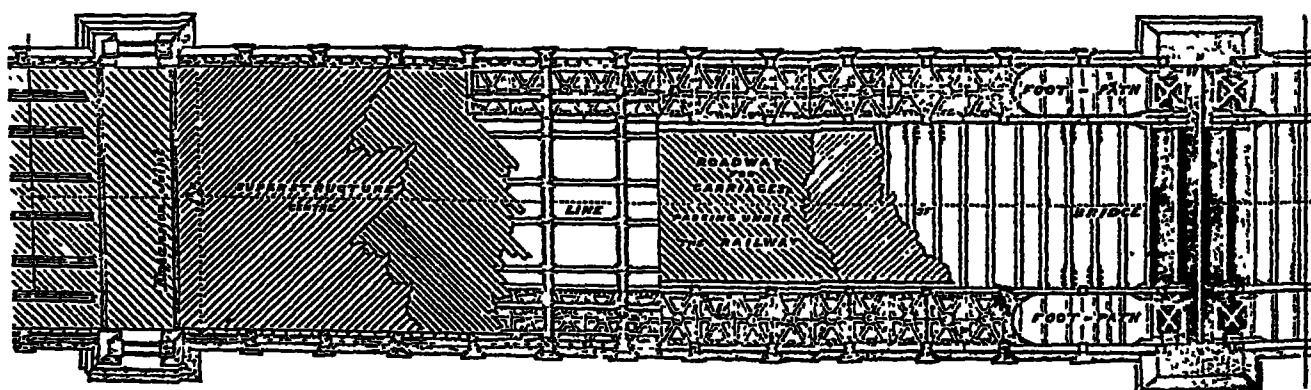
Plan of High-Level Bridge, Newcastle.
